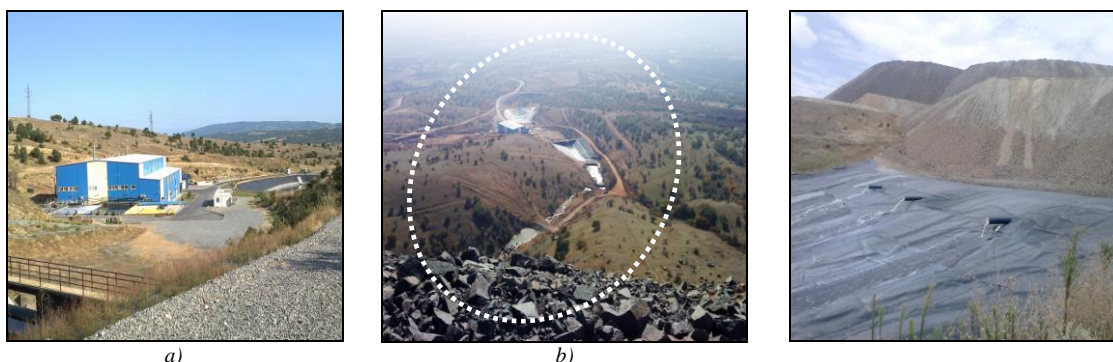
a) Cu-leaching facility at the Buchim Mine the construction of the leaching facility; b) Panoramic view of the leaching facility; c) Cu drainage from an oxide ore pile
